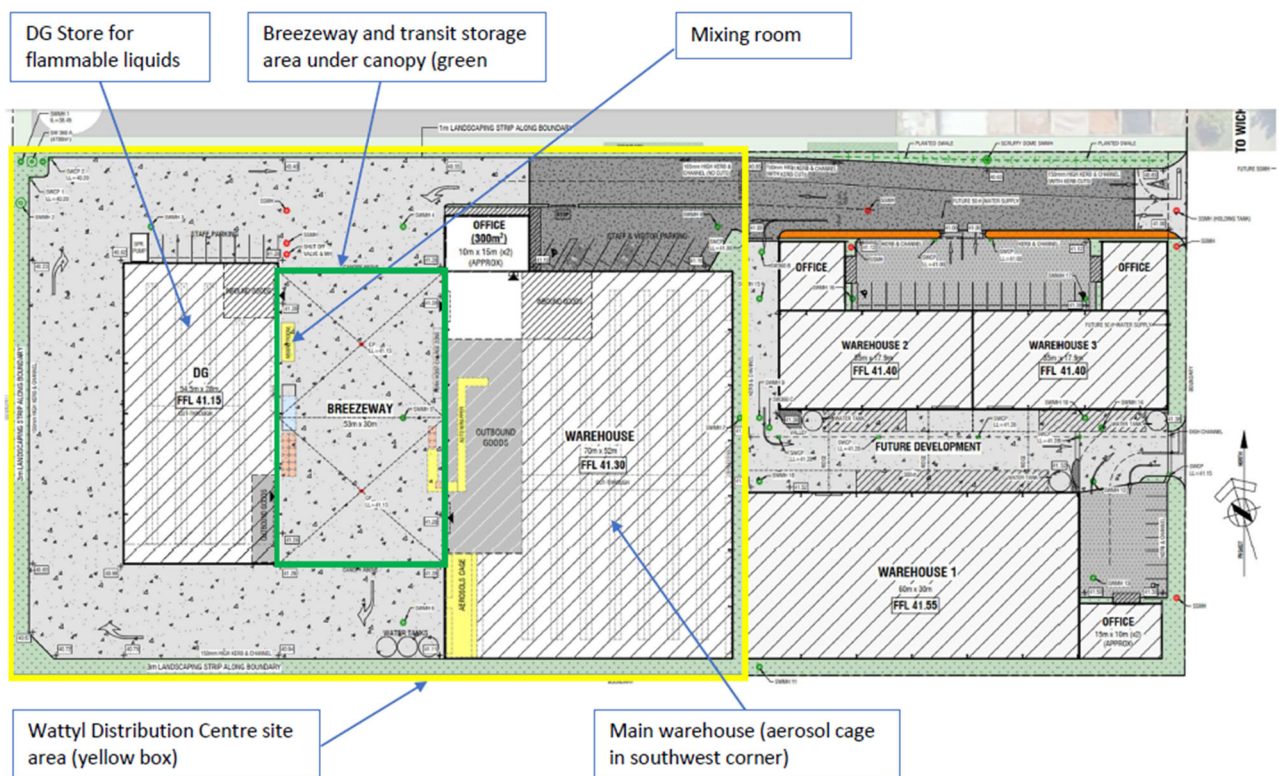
Proposed site plan showing indicative hazardous substances locations (sourced from Proposed Site & Finished Levels Plan by Stiffe Hooker Ltd)
